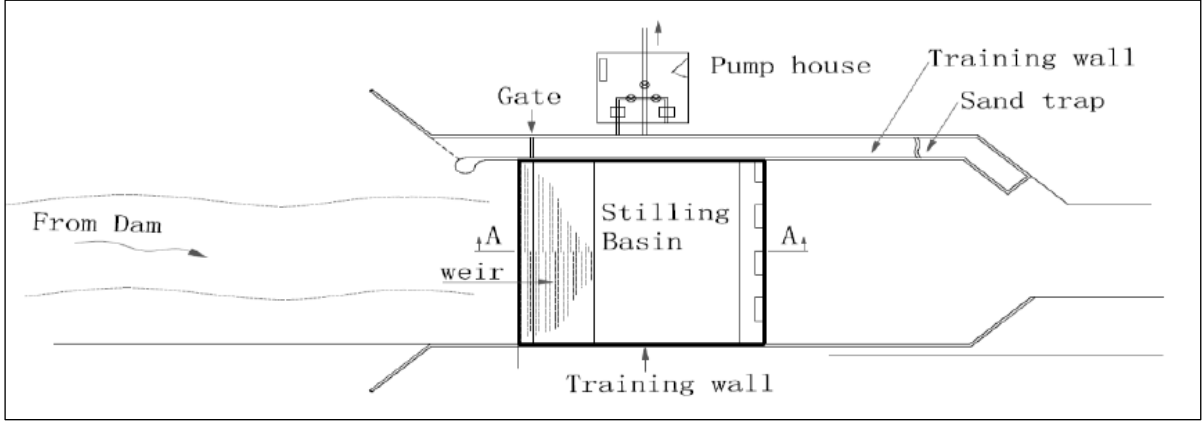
Sketch showing plan view of the proposed new Mzuzu weir and its associated facilities
